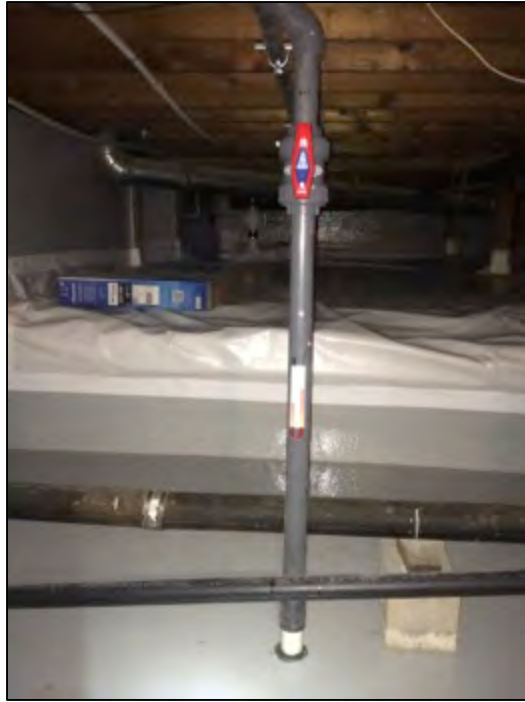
Completed passive exhaust stack with wind powered ventilation fan.
